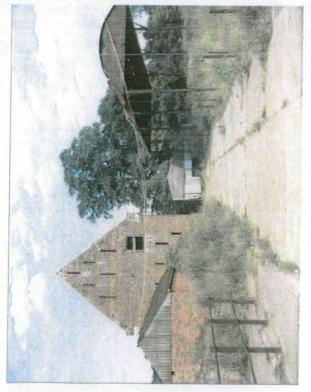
View west along the south elvation of the main barn. To the left are buildings E and F, and to the right is the steel framed barn, building H and behind that building I, the modern prefabricated shed.
